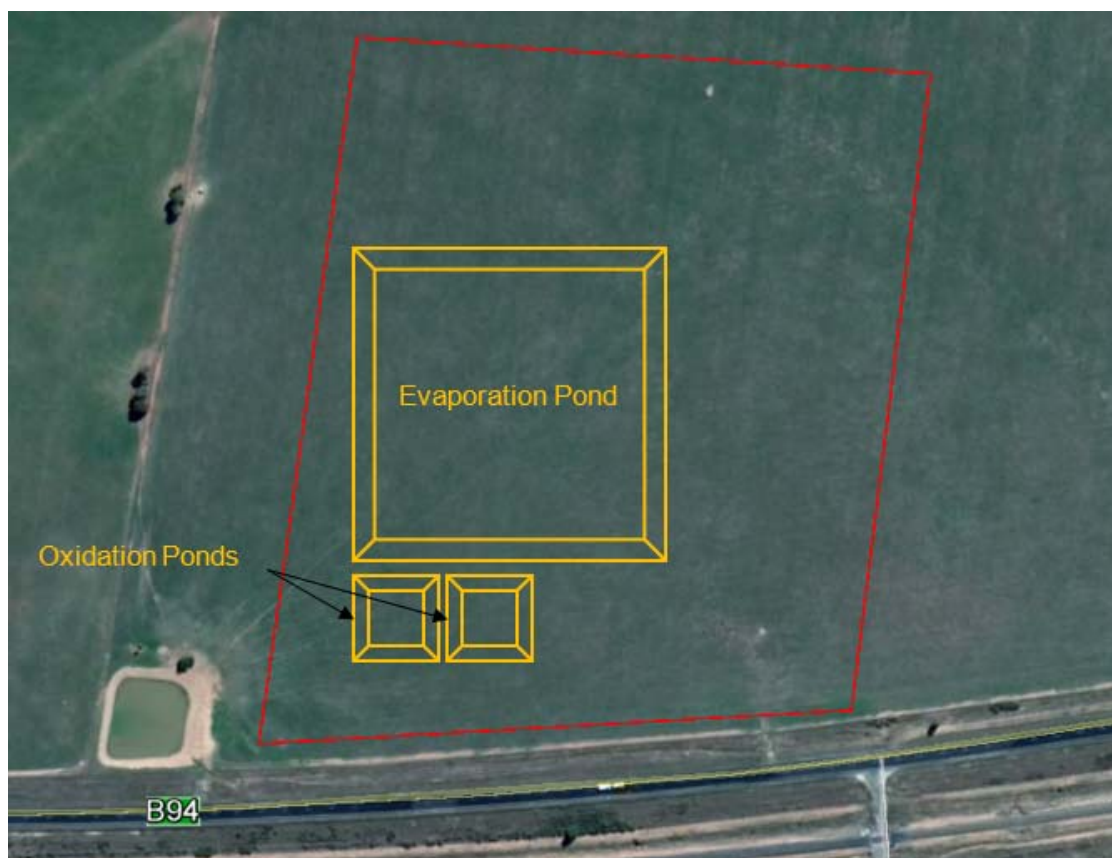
Oxidation Pond STP with an Evaporation Pond
